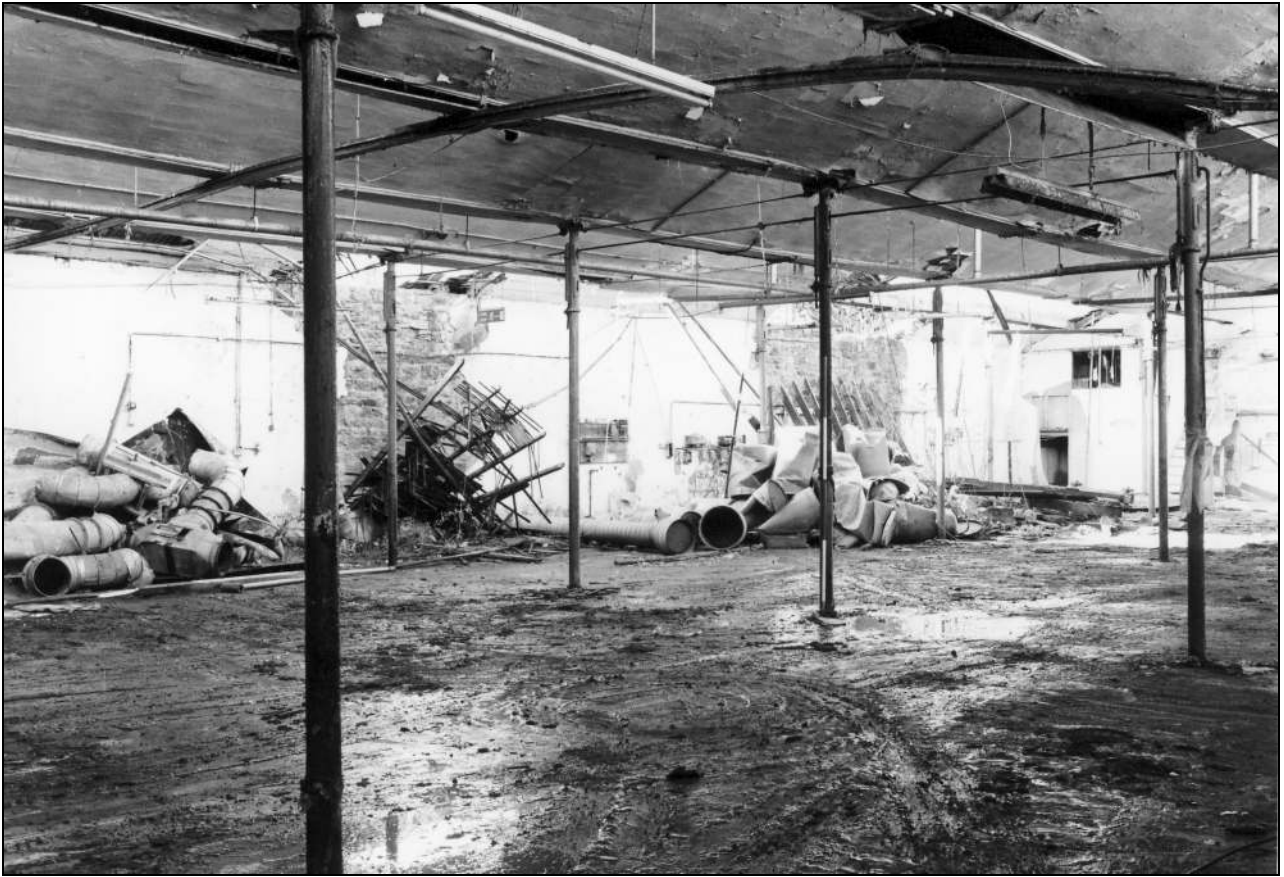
General view of weaving shed interior, from the north-east (film 1, frame 1)
